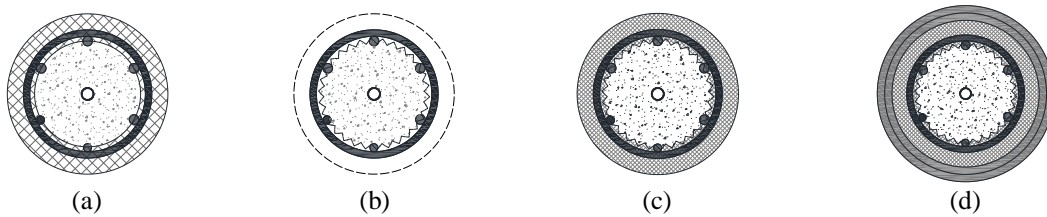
Repair process of corroded columns: (a) identification of damaged areas; (b) removal of deteriorated concrete cover and surface preparation; (c) placement of non-shrink cementitious grout; (d) application of C-FRCM/C-FRP wraps.
